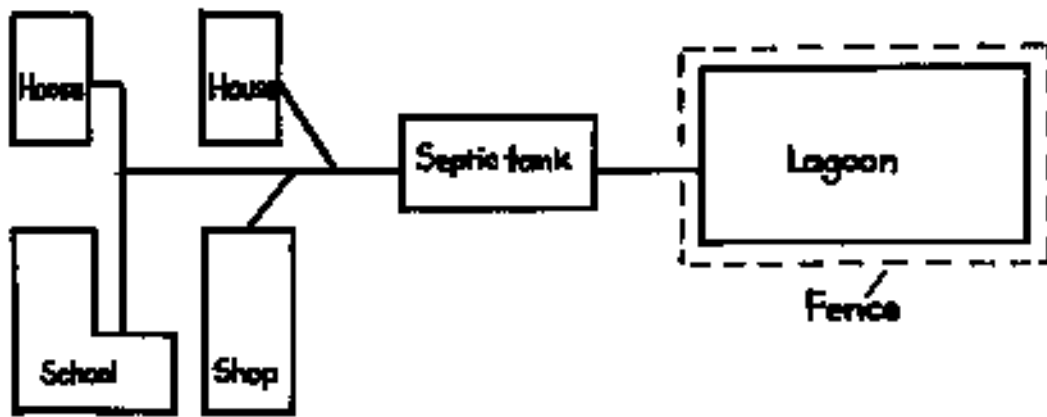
Plan view of a full sewage system with a large septic tank.
